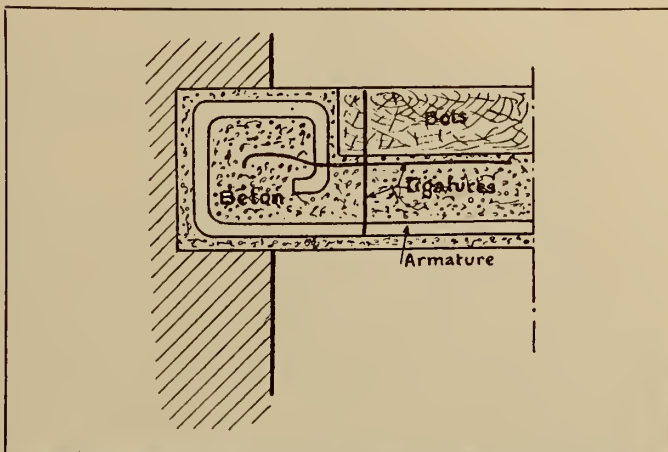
GERMAN STEEL-WOOD REINFORCED CONCRETE BEAM (BETON, CONCRETE; BOIS, WOOD; ARMATURE, STEEL REINFORCEMENT; LIGATURES, TIE PIECES)
